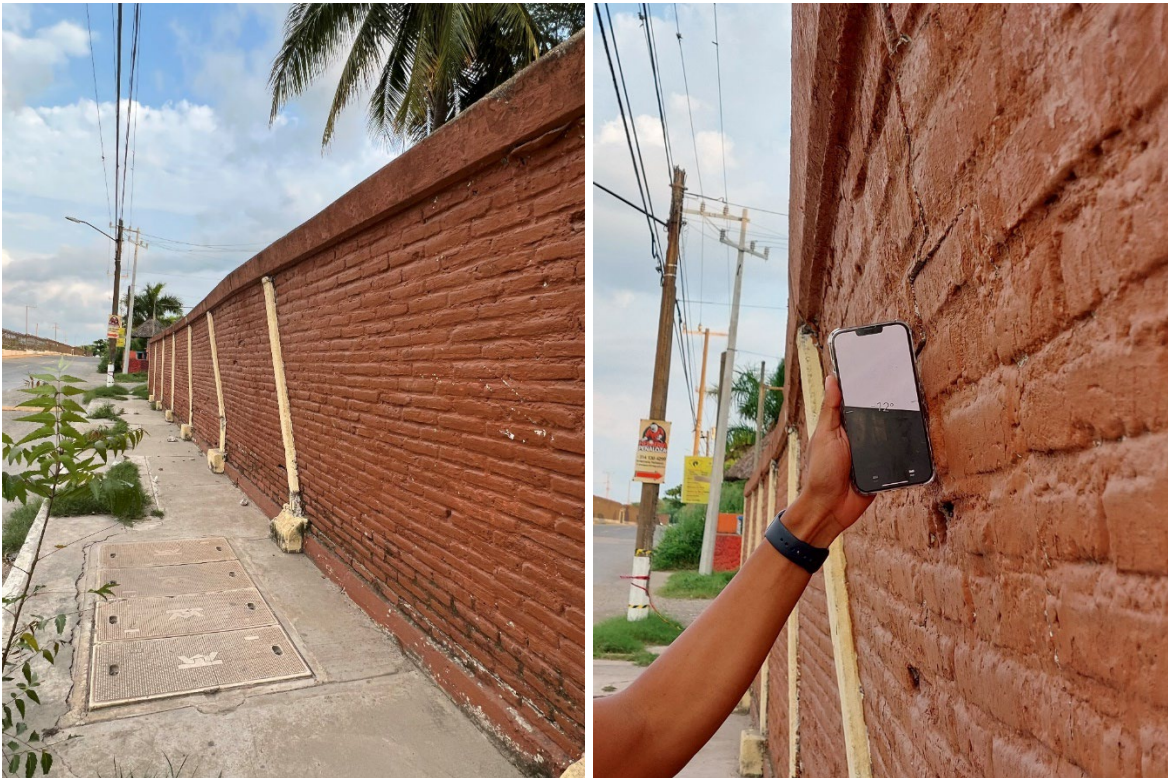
Column failures of perimeter walls of school, Manzanillo, Colima
